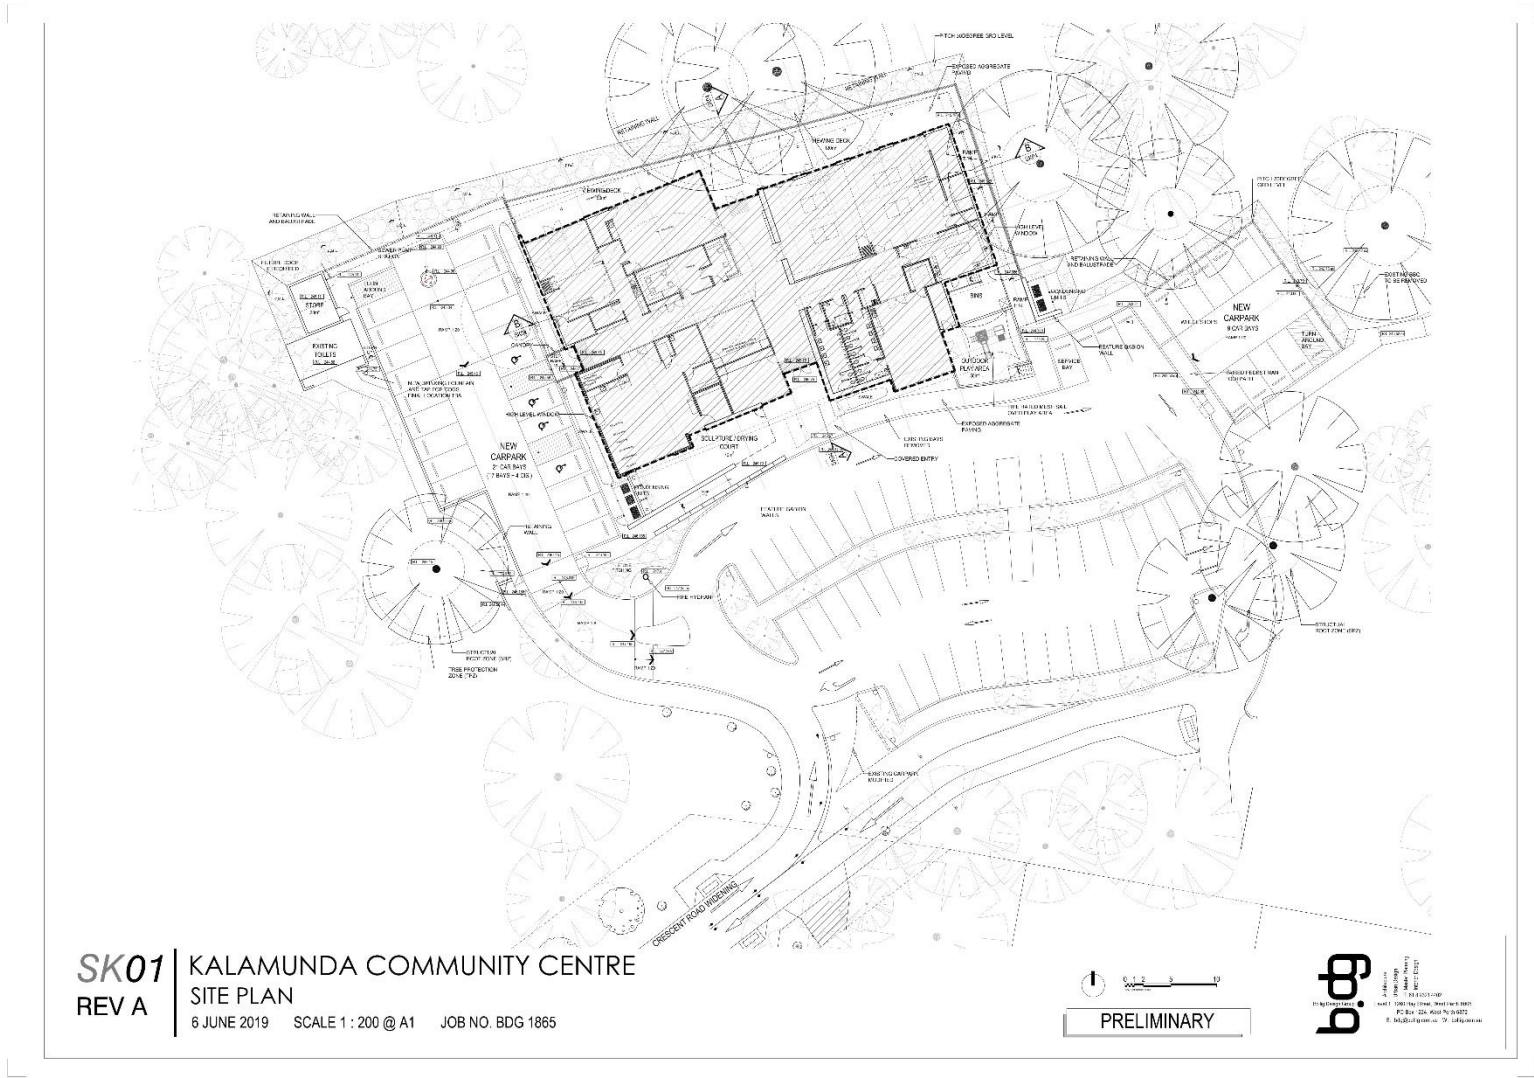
Road widening for KCC access, Crescent Road, Kalamunda.
